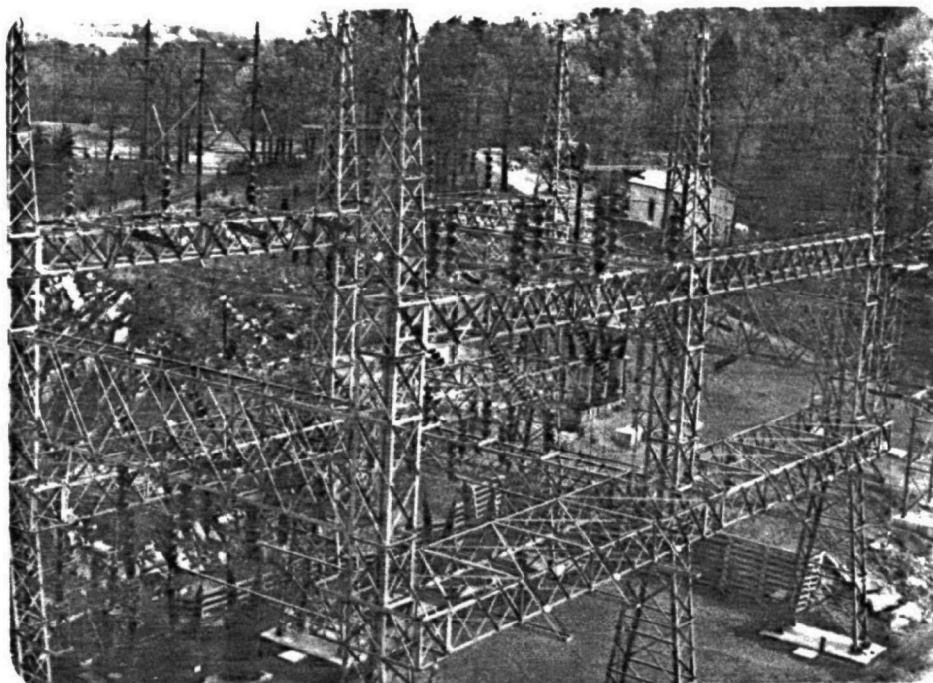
View from rooftop facing northeast showing electrical substation serving the plant.
